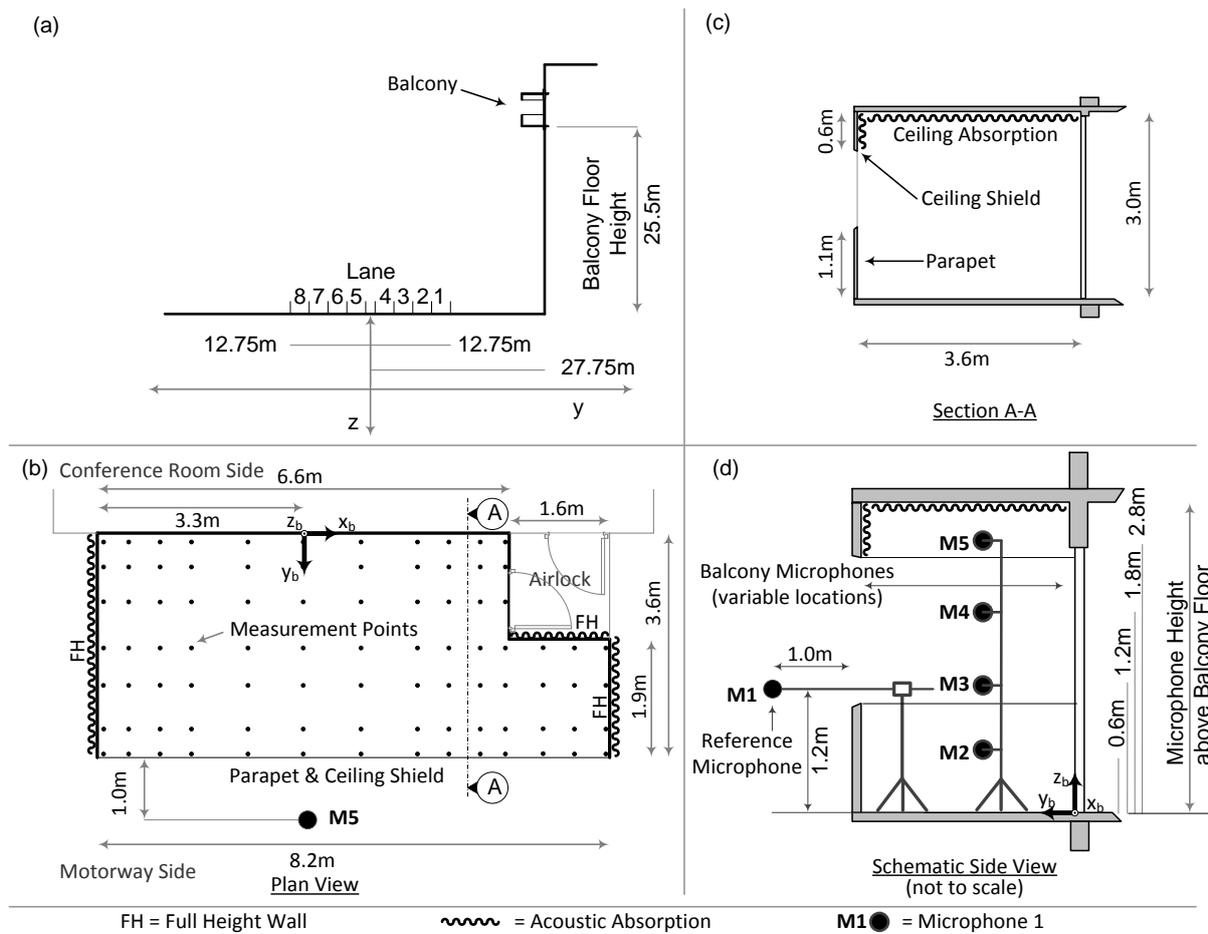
Site and model geometry, (a) dimensions of the street and balcony location, (b) plan view of balcony with relevant dimensions and showing microphone locations in horizontal plane, (c) section view of balcony with relevant dimensions, and (d) section view showing microphone locations designations and vertical locations.
